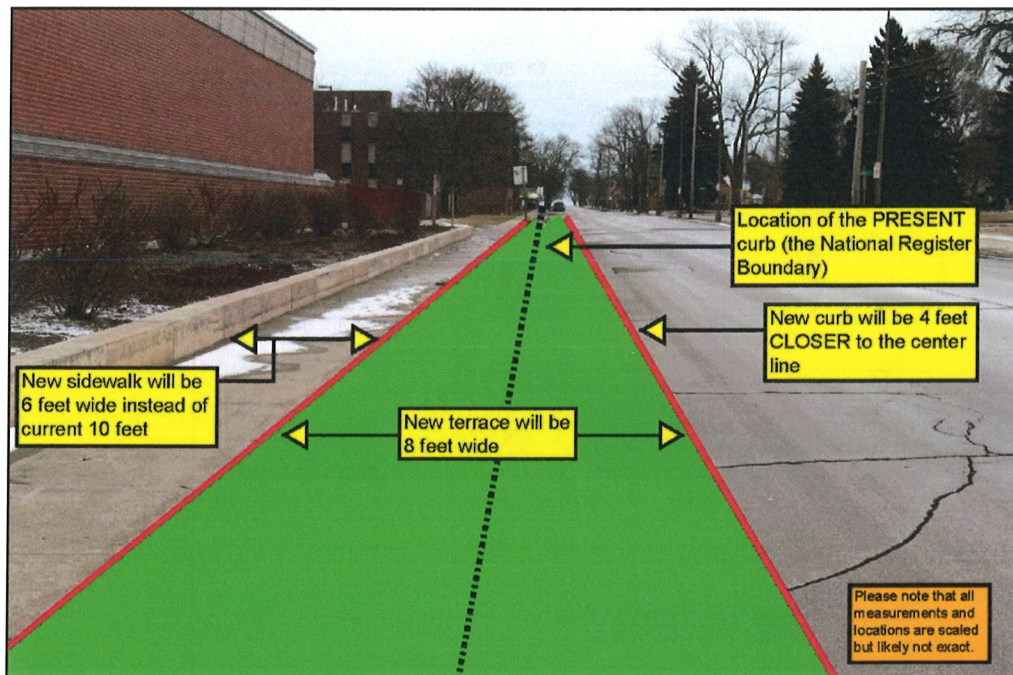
Under the proposed plan, the roadway will be moved AWAY from the Wright buildings, thus increasing by 4 feet the buffer between the new roadway and the historically significant resources. The sidewalk has no historical association with Wright or the Administration Building.
